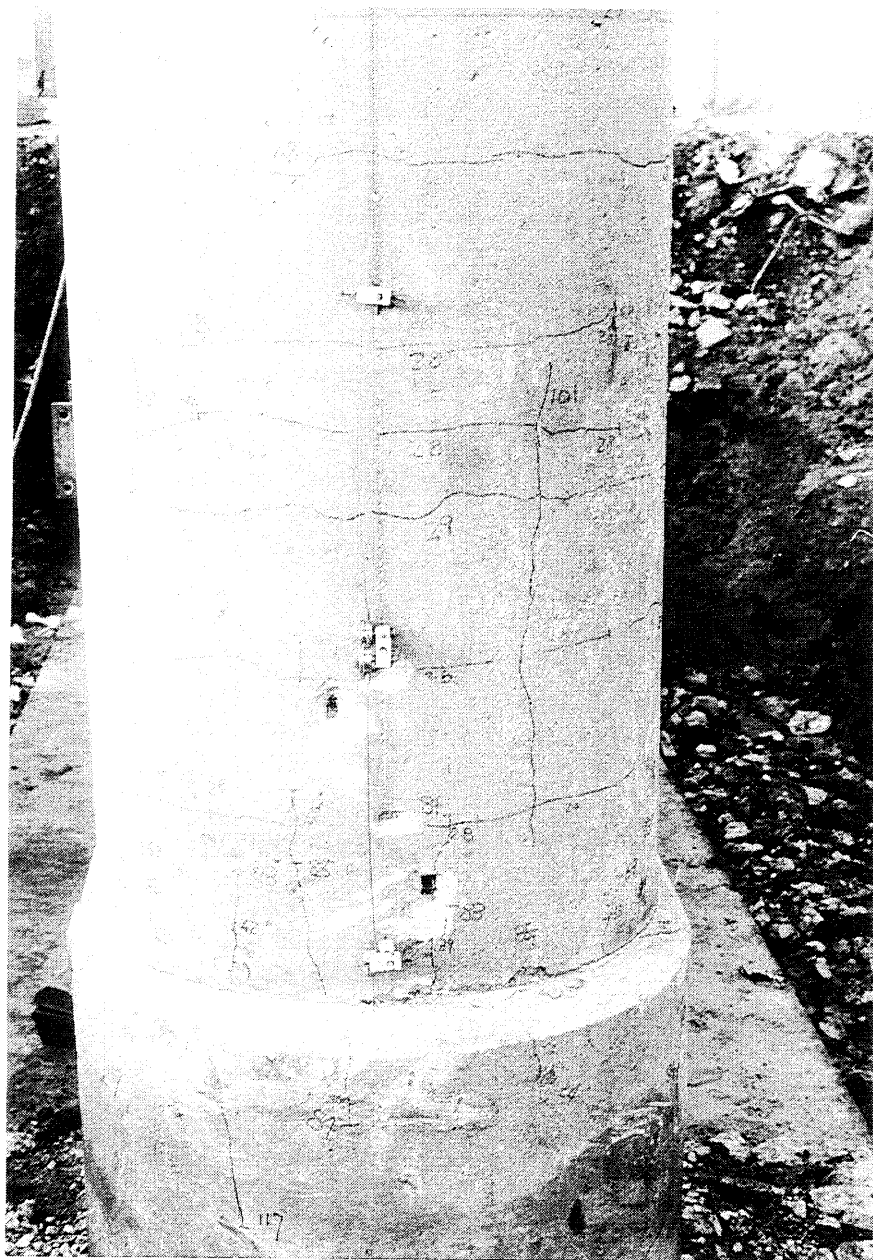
The Last Stage of Cracking for the South Column of Pier B14
